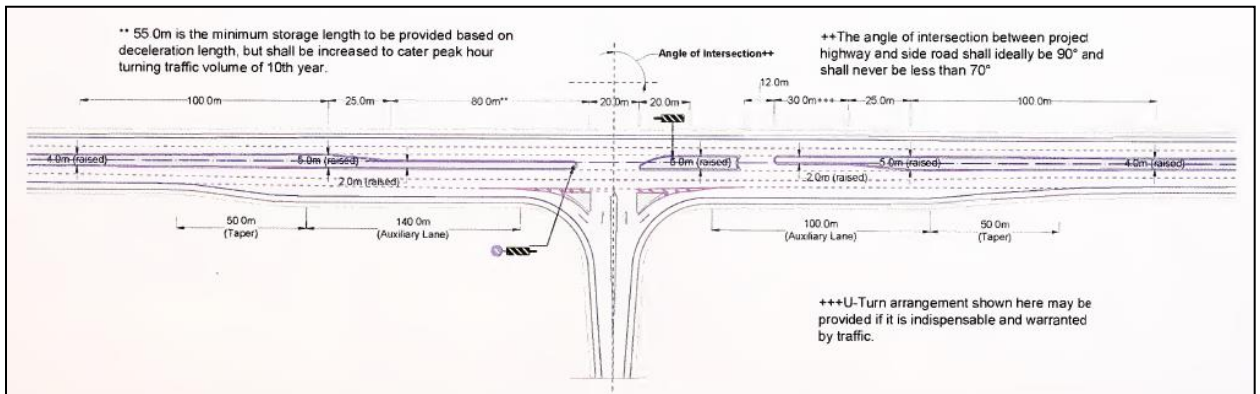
Layout for T-Intersection with U-Turn Facility (At locations having substantial U-Turn Traffic volume)
